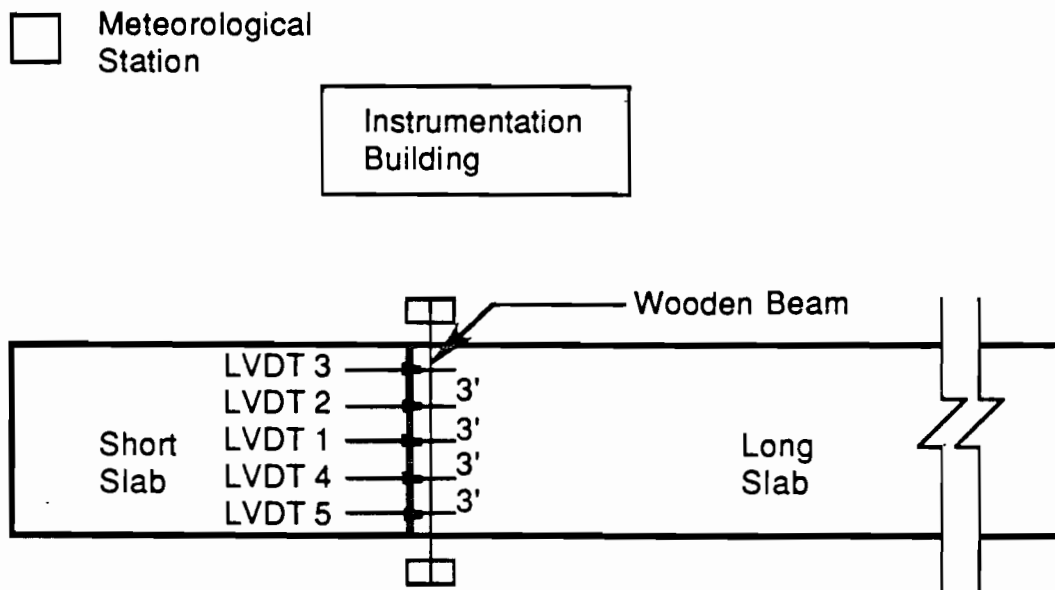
Arrangement of the LVDTs and position of the beam within the BRC testing slab.
